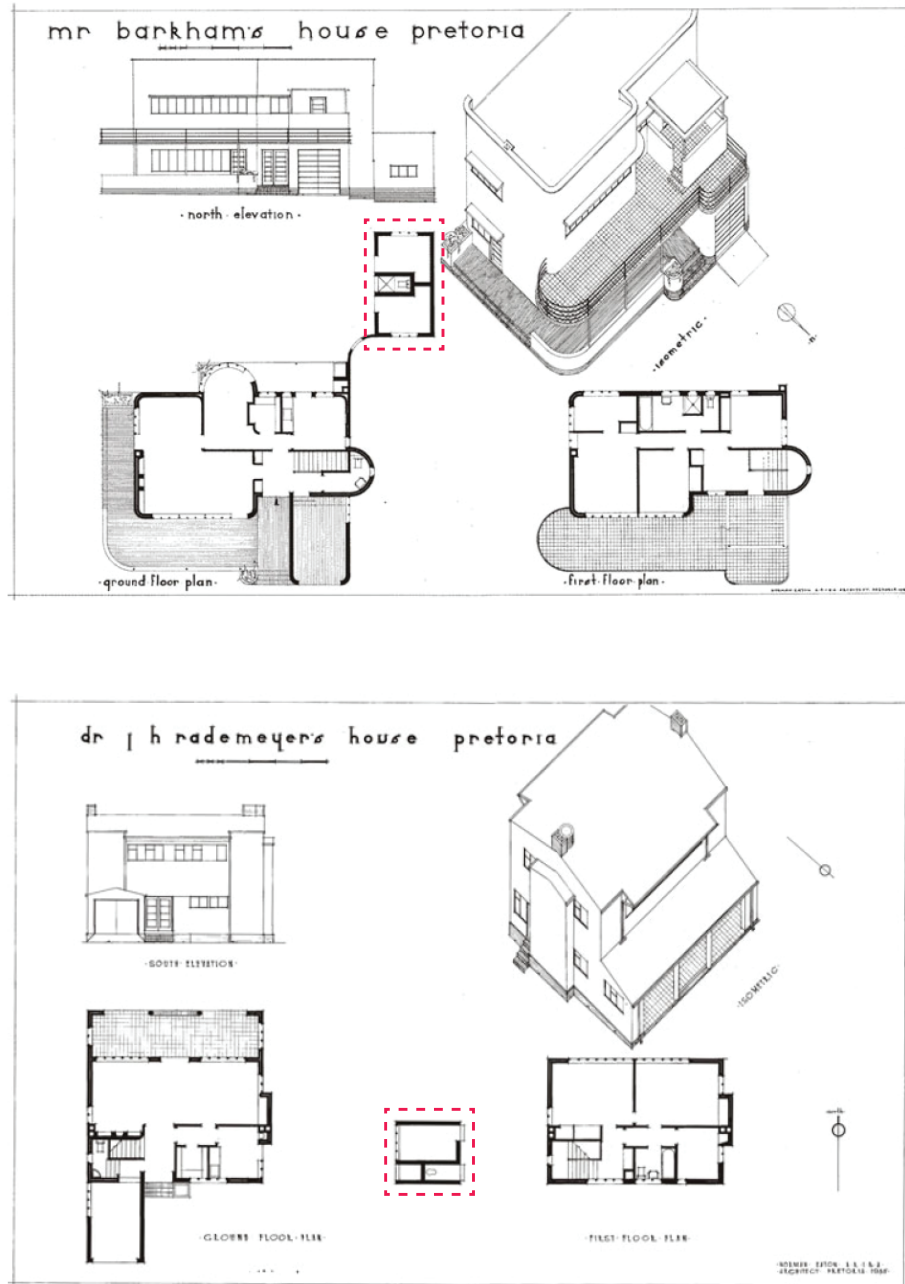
Floor Plan of Domestic Worker Accommodation (indicated in red)
